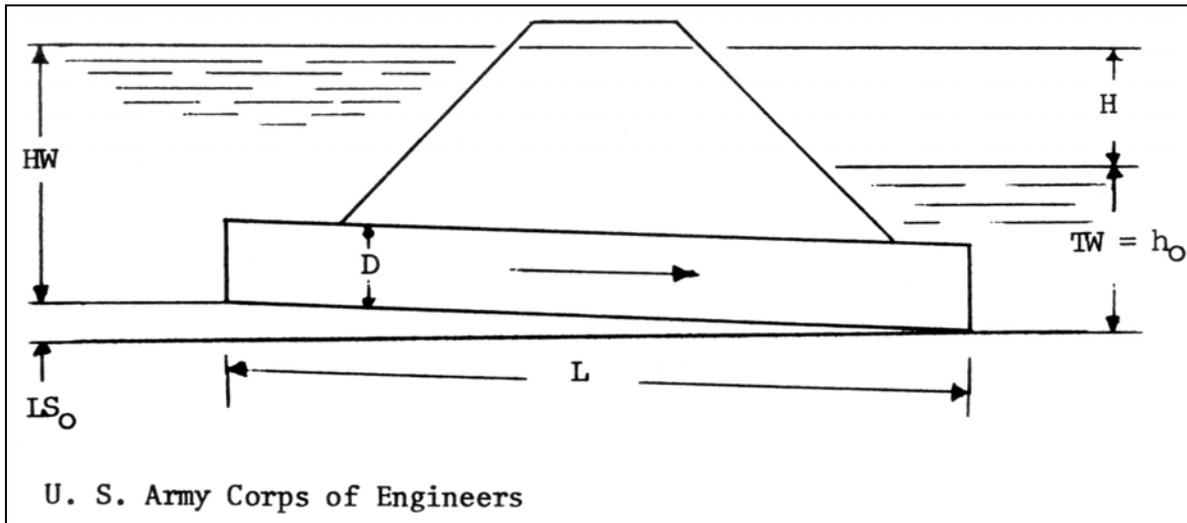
Tailwater Elevation at or Above Top of Culvert
